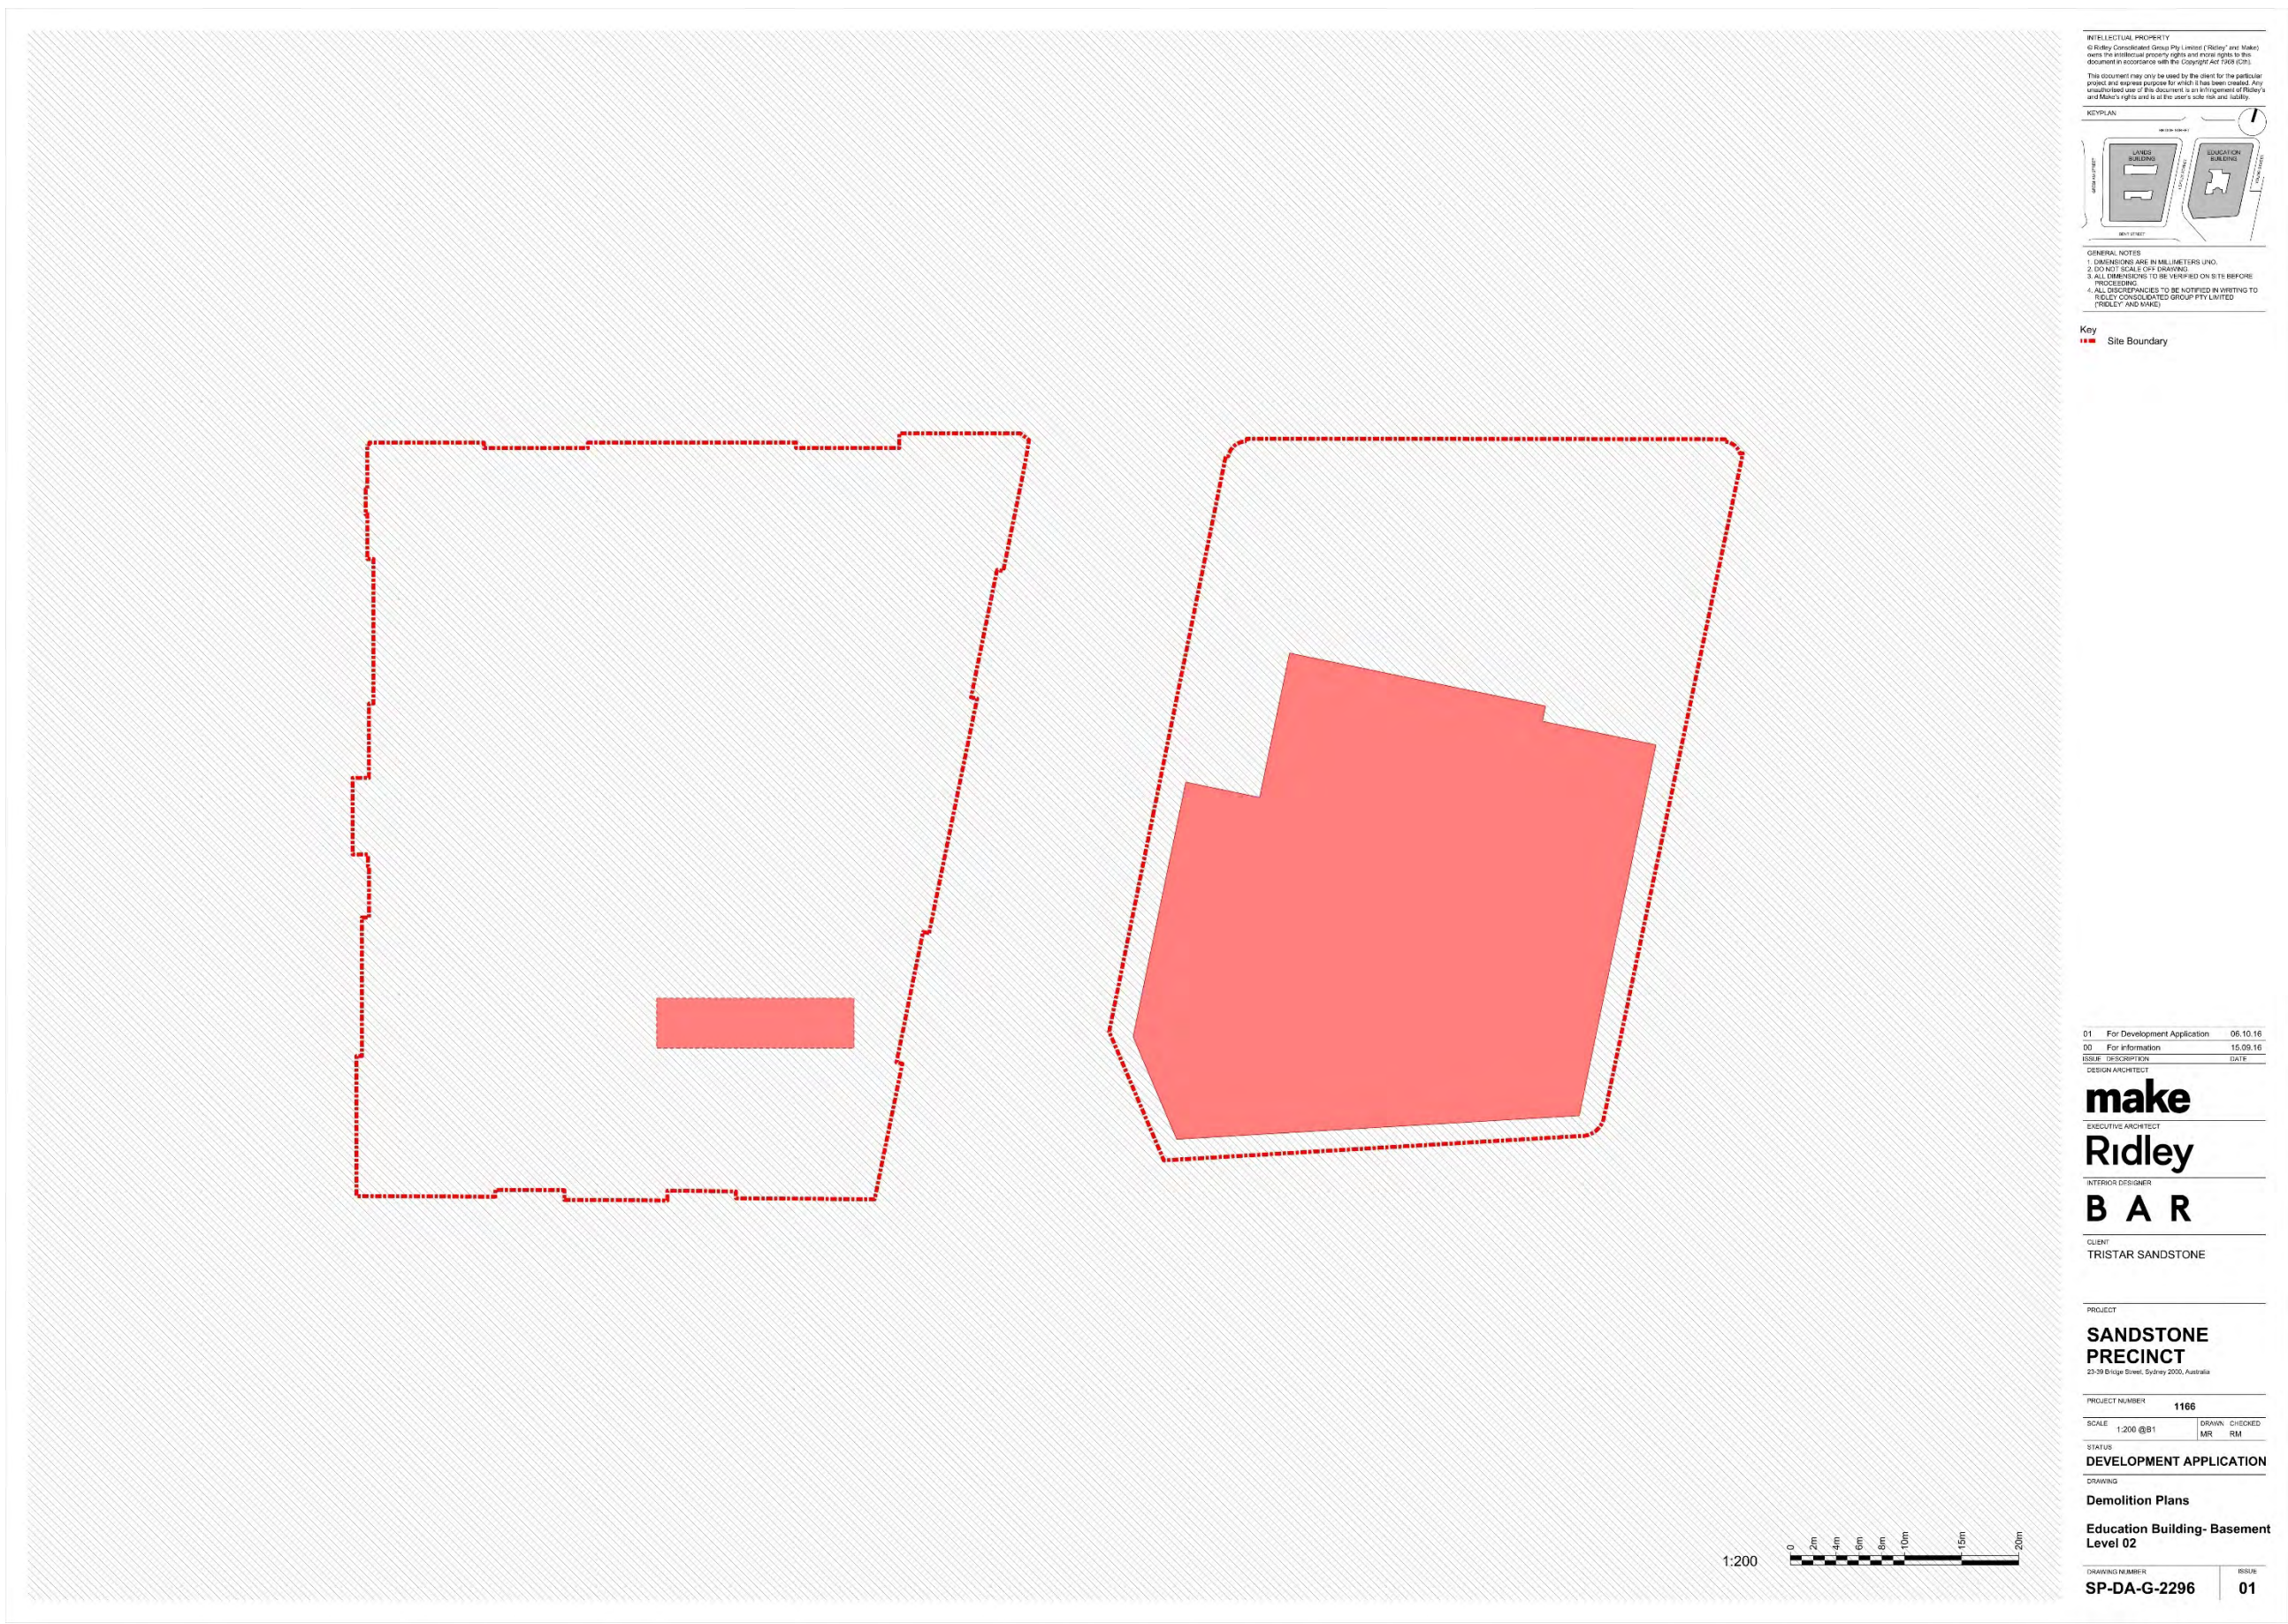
Demolition Plans—Lands building lift and services and Education Building - Basement 2 (c. 4-8m below current ground surface) (Source: Make & Ridley, Drawing SP-DA-G-2296 14.10.16)
